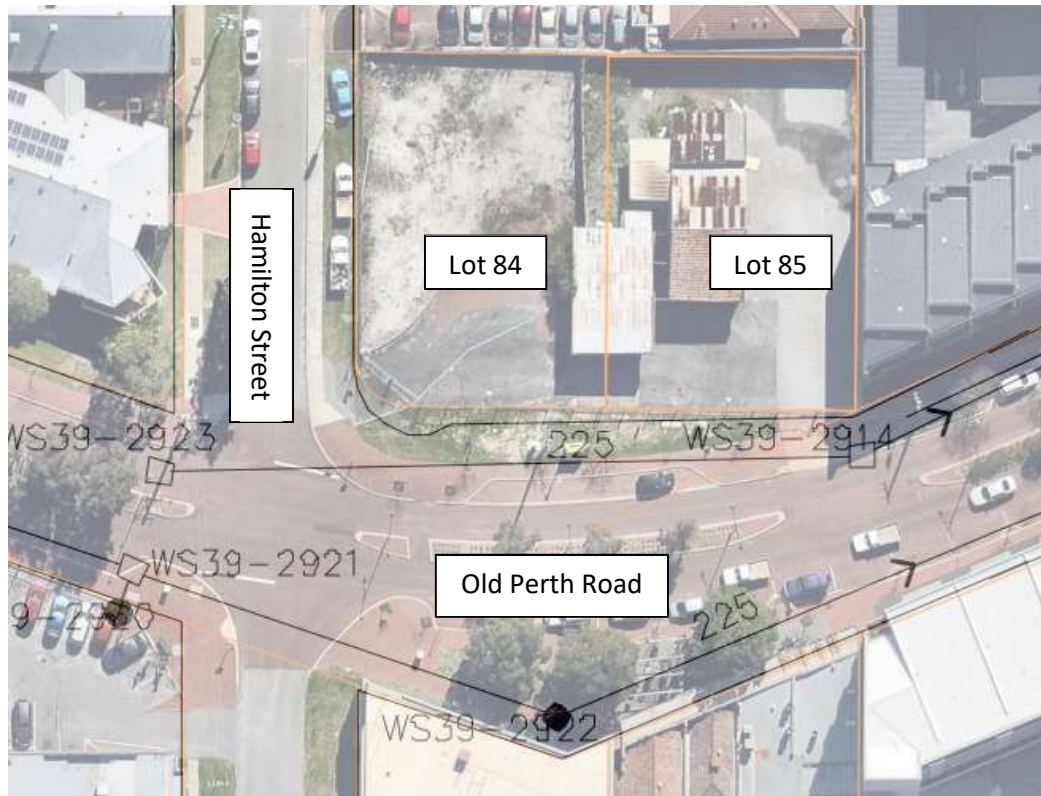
Site Aerial and Town of Bassendean stormwater drainage overlay
